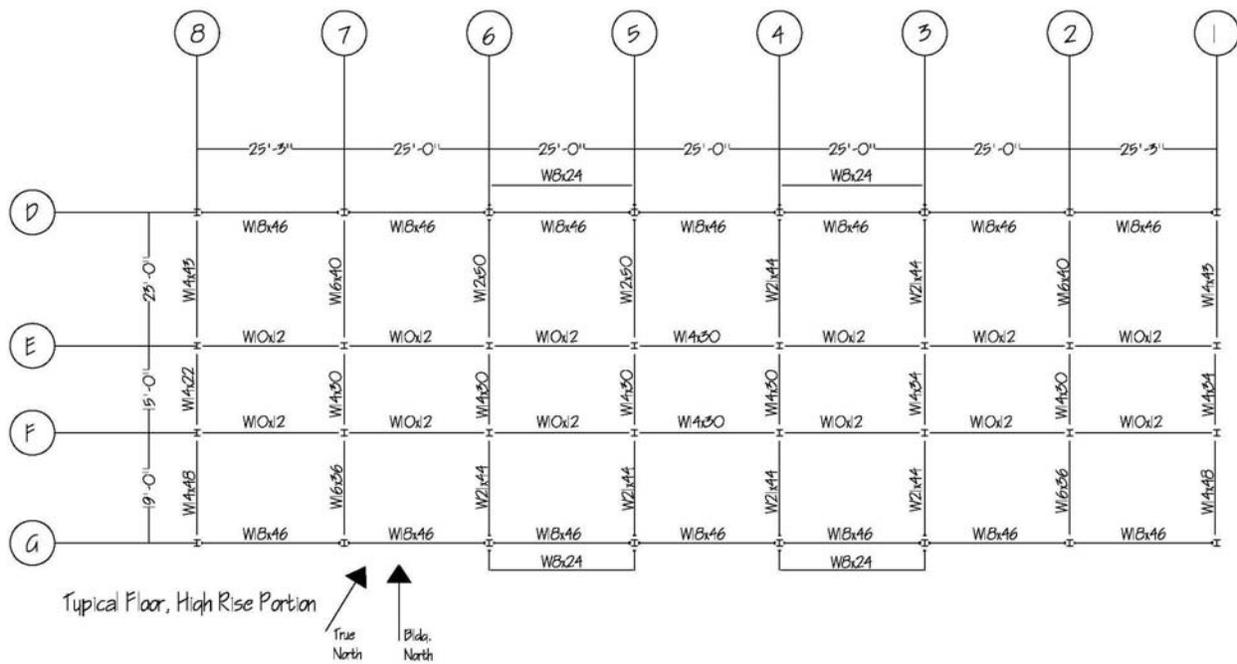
The tower portion of the Erie Convention Center and Sheraton Hotel has a typical framing plan as shown here. The three bays in the North/South direction are sized 19', 15', and 23'. In the East/West direction, the two exterior bays are 25'-3", with five 25' interior bays.
